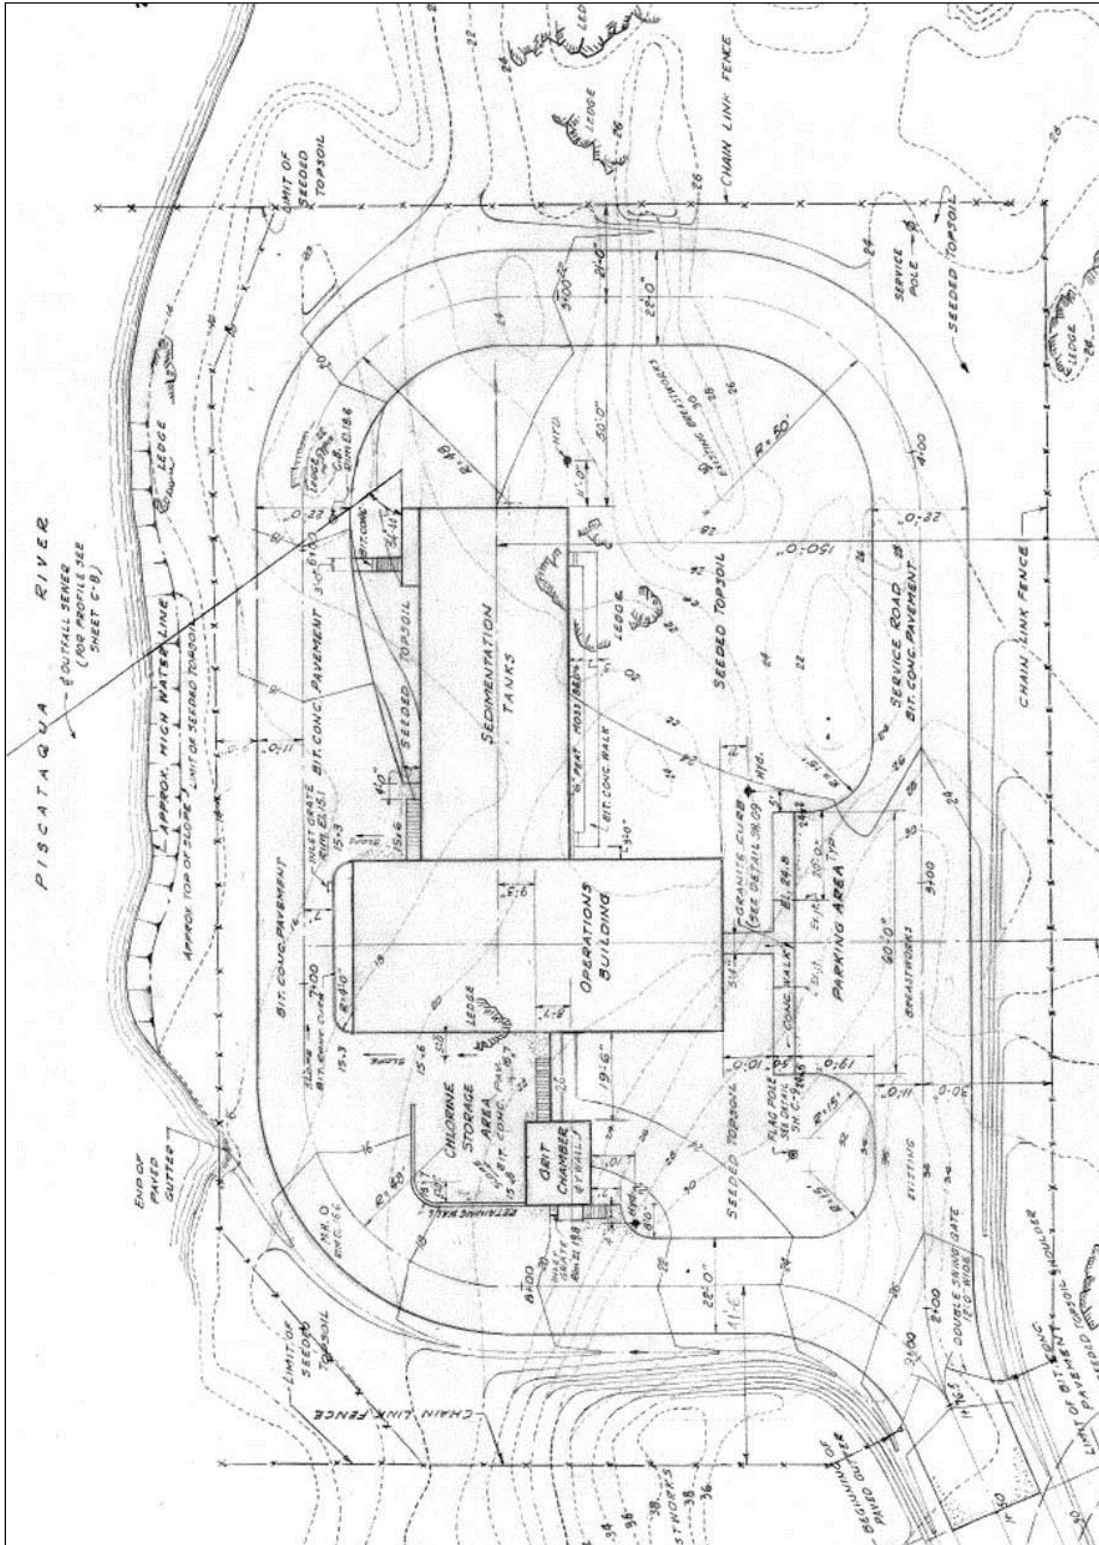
Record drawing of Portsmouth Sewage Treatment Plant built 1965, showing Operations Building, (present Sludge Processing Building), Grit Chamber and Sedimentation Tanks, comprising entire 1965 facility. Clip from sheet C-2, Grading & Planting Plan (Metcalf & Eddy, 1963).
